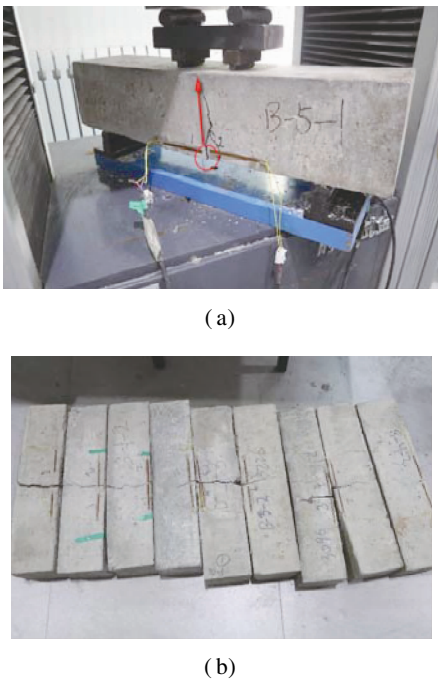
Failure modes of the prismatic concrete specimen. (a) Crack development during loading onto the specimen; (b) Prismatic concrete specimen after failure
